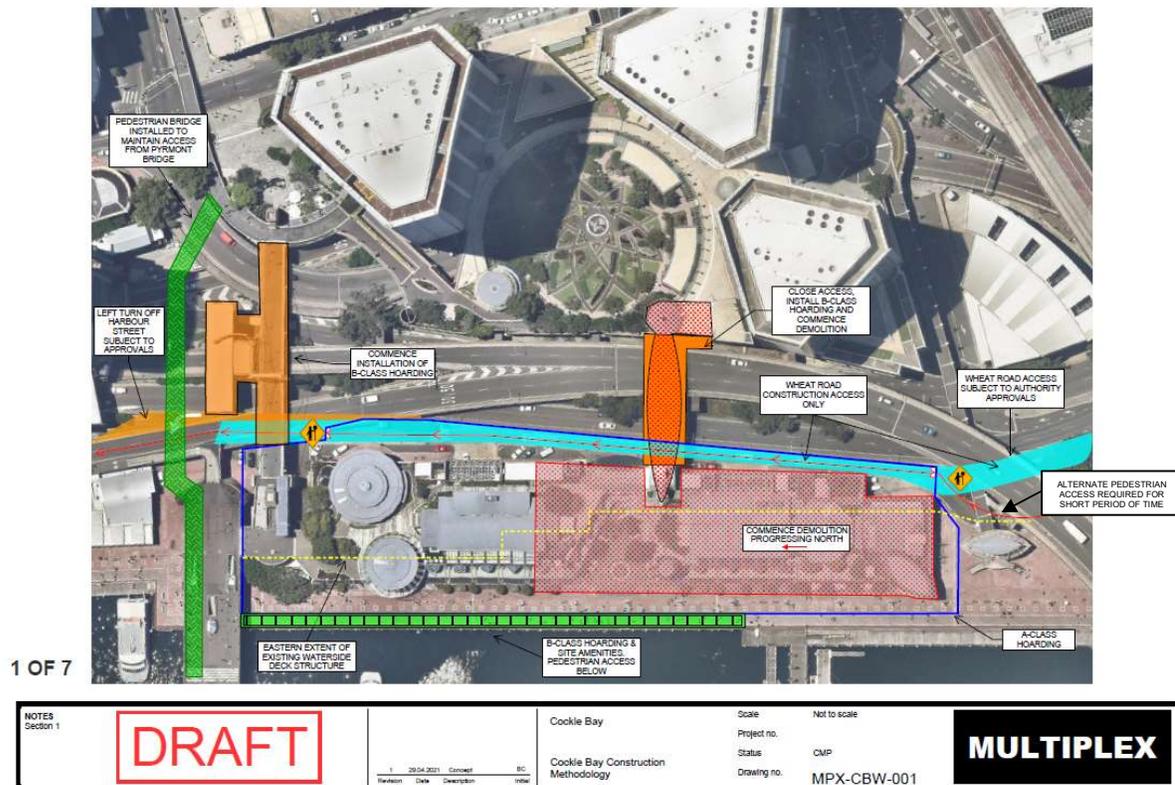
Temporary pedestrian bridge (Source: Construction Management Plan, Multiplex)
